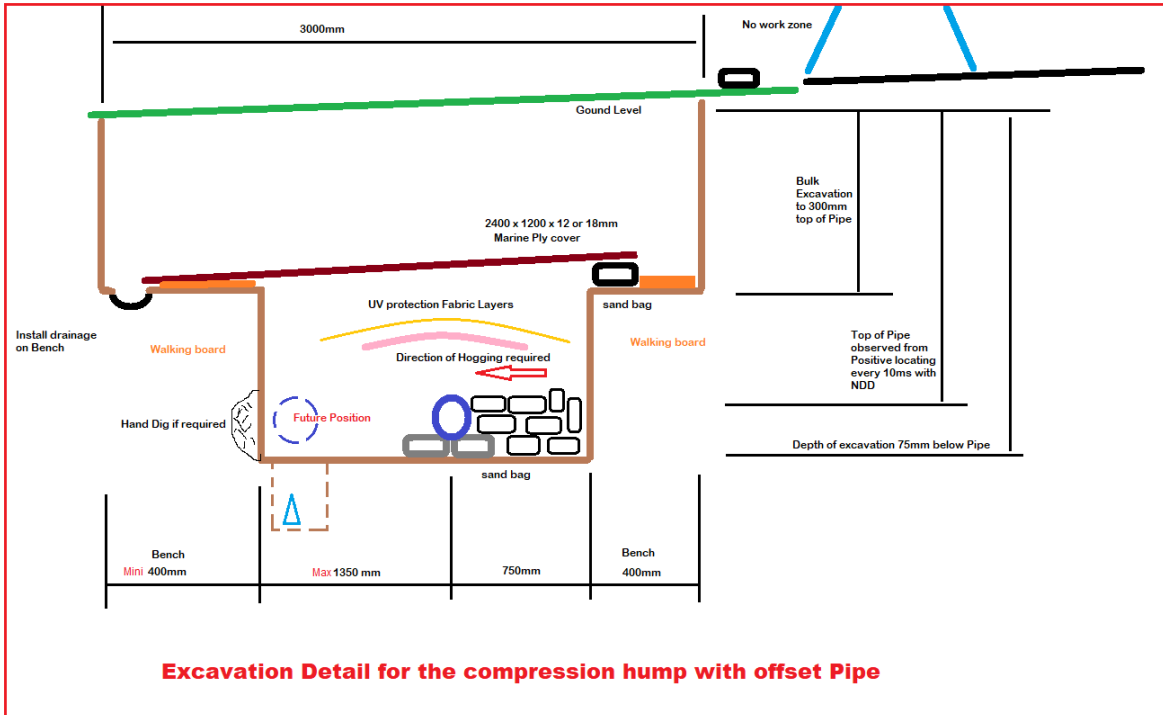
Typical Excavation Details for Compression Hump with offset pipe
